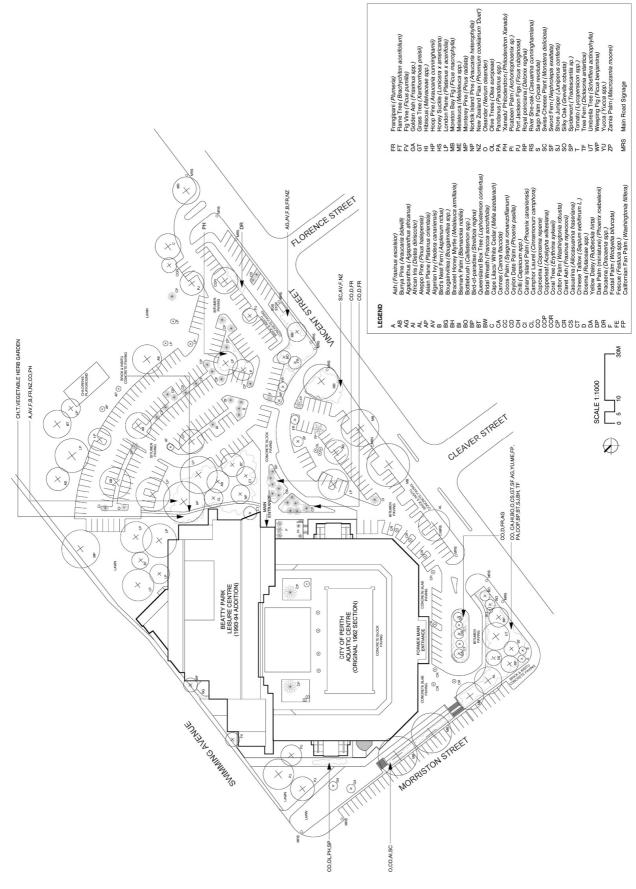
Figure C.Beatty Park and Beatty Park Leisure Centre, Site Plan.
